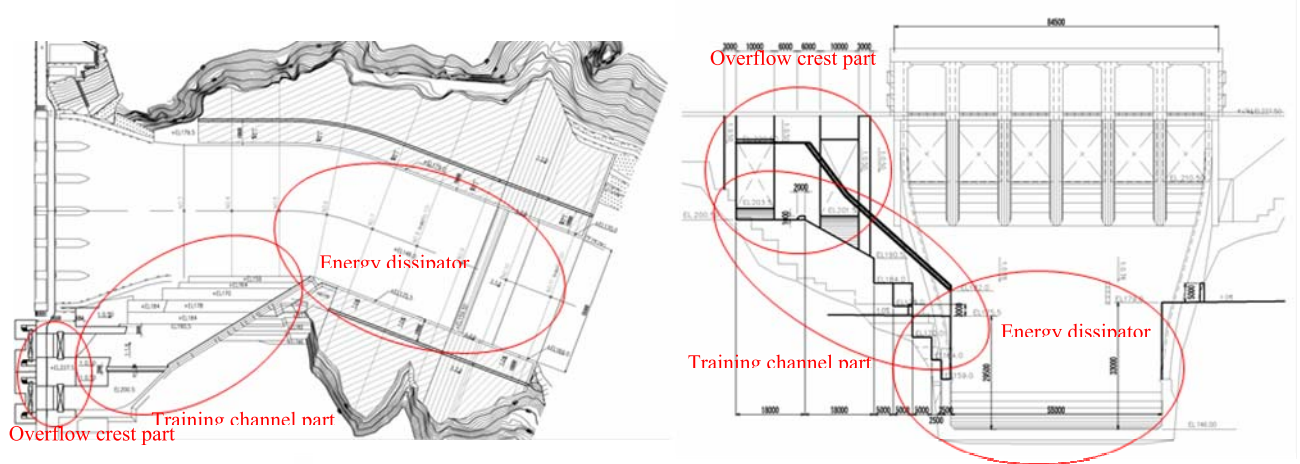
Plan view (left) and downstream view (right) of the final design shape
